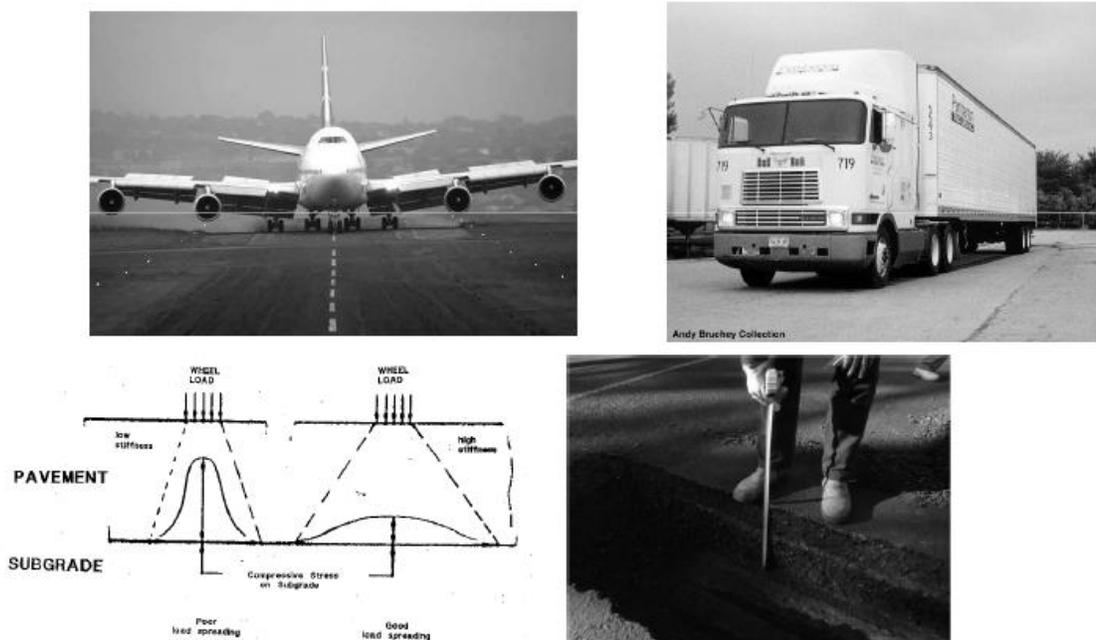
Subsurface stresses in road pavements and airport runways are increased by wheel load on the surface
